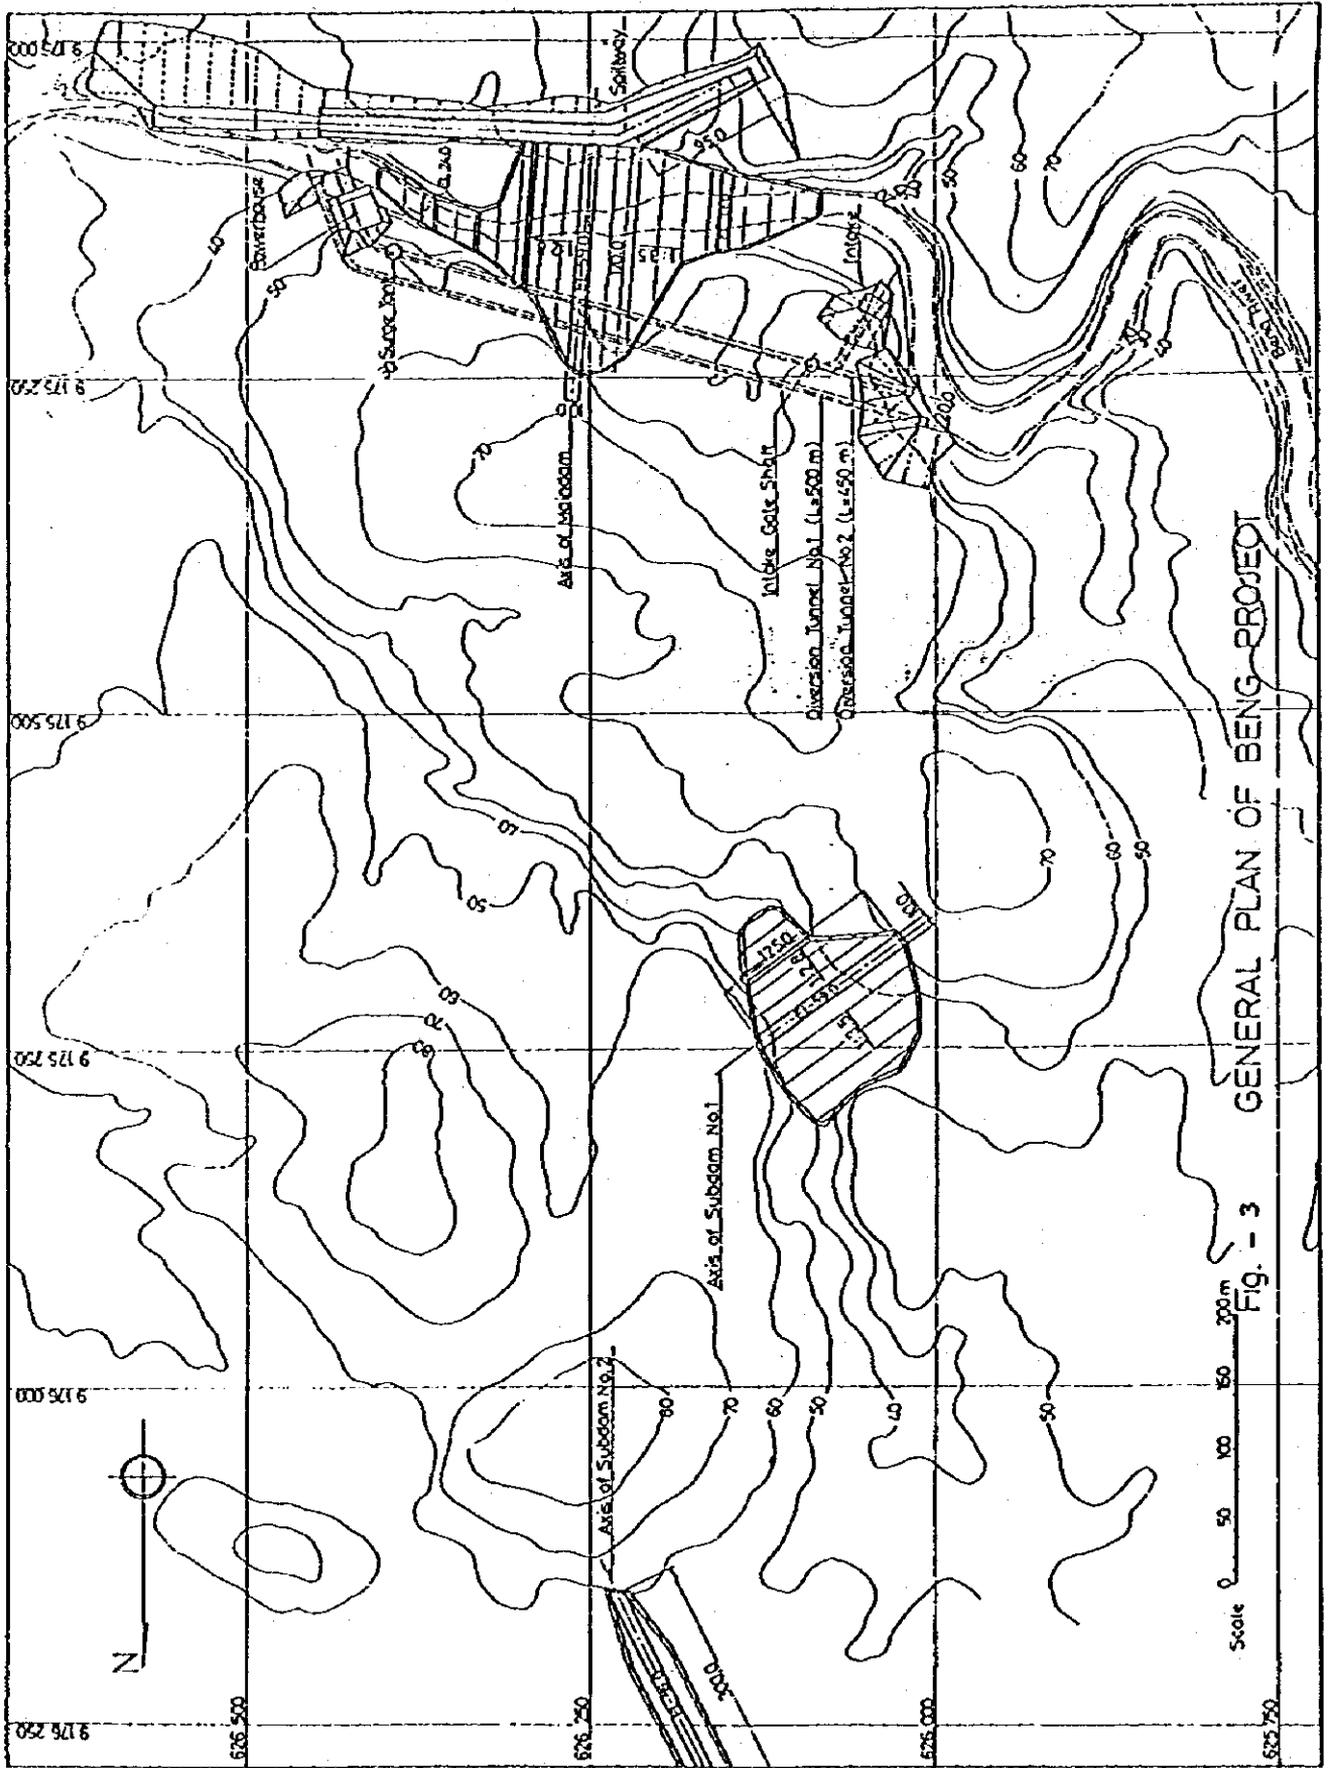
GENERAL PLAN OF BENG PROJECT
